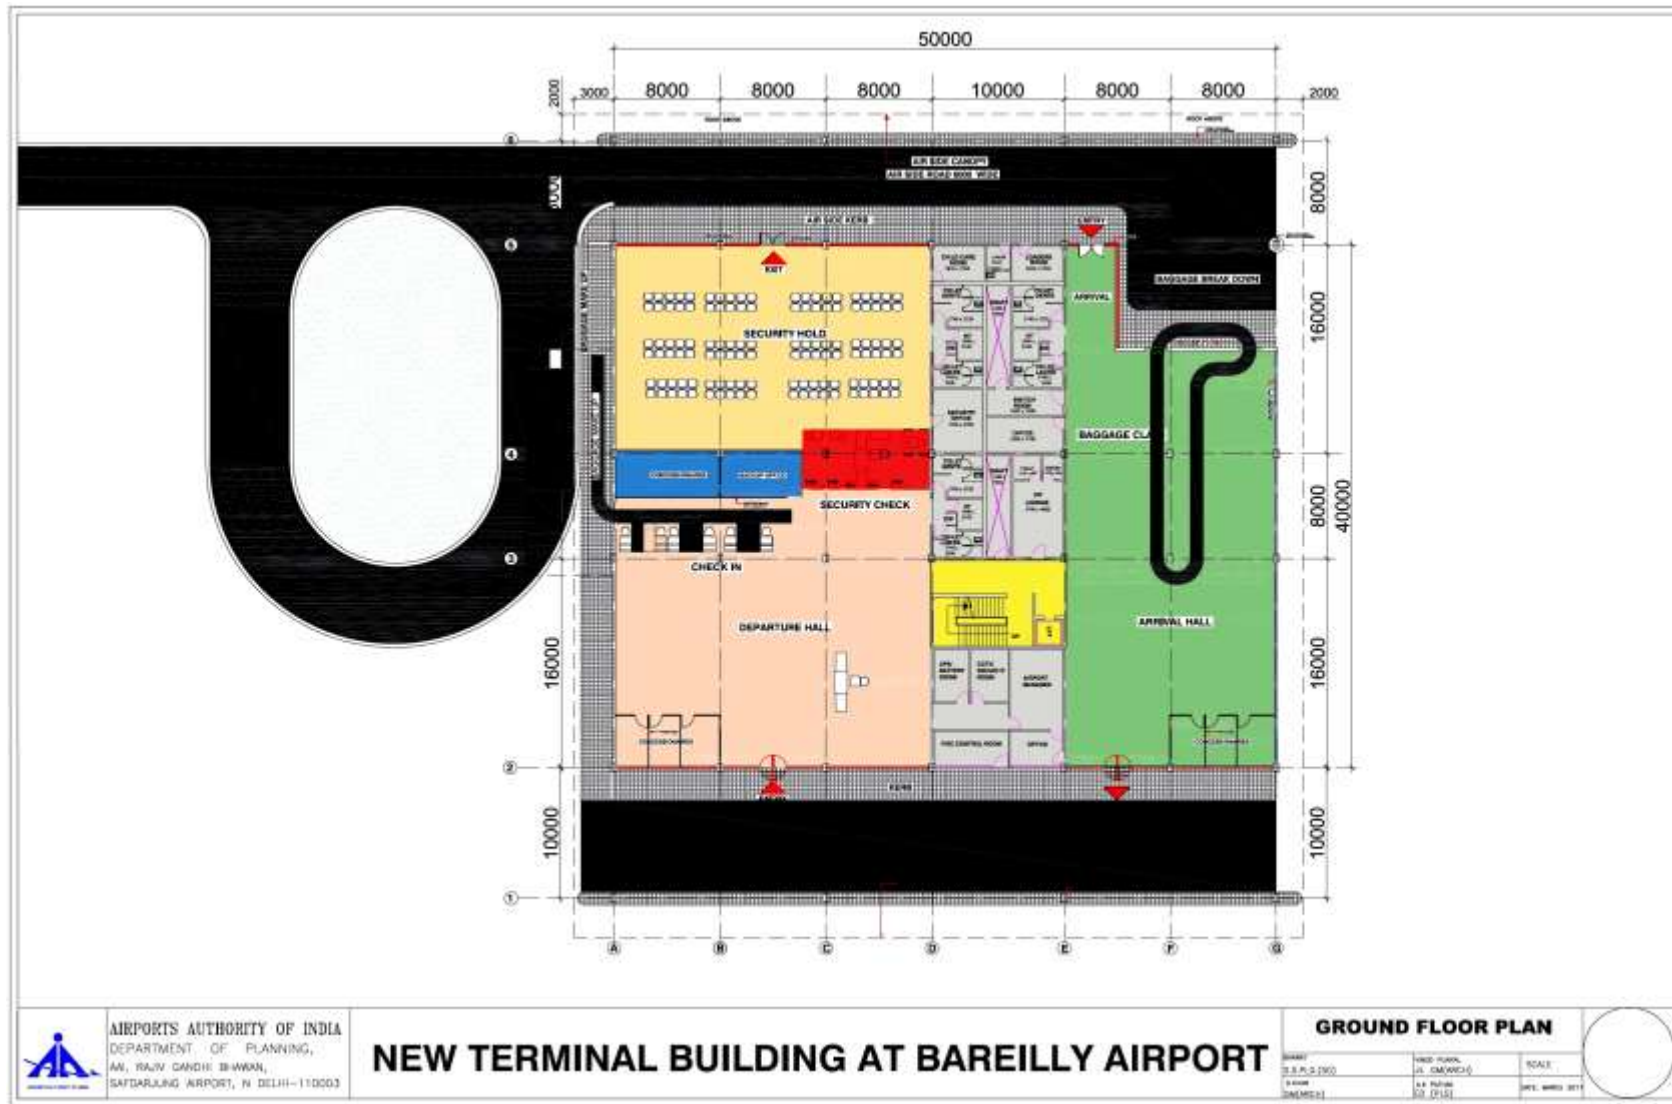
Ground Floor Plan for Terminal Building at Proposed New Civil Enclave at Bareilly Air Force Station
